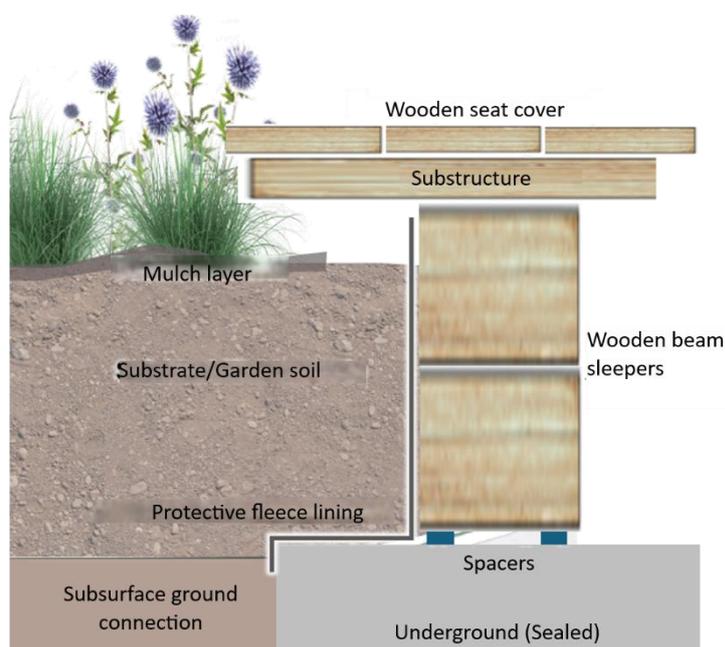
Construction of planting area with ground connection, wooden beams/sleepers and wooden seat support
